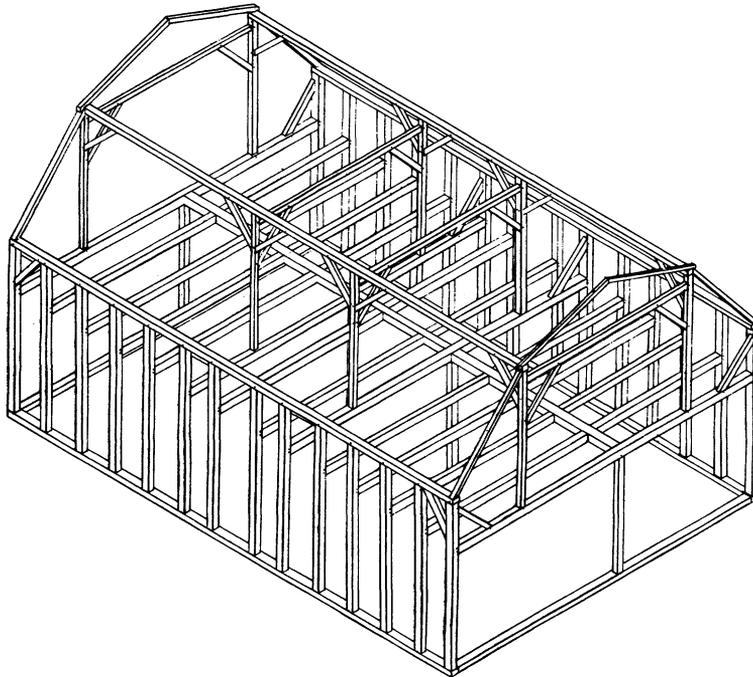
Dutch American hybrid framing: anchor-bent posts with a second-floor summer beam and second-story anchor bents at box-frame intervals. Palin house, ca. 1750, East Fishkill, Dutchess Co., N.Y. (Drawing, C. W. Zink.)
